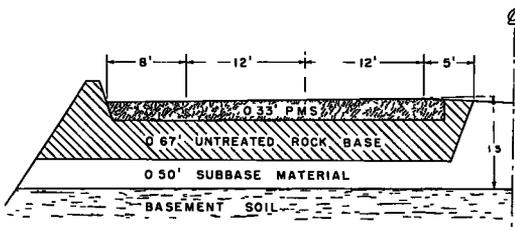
Typical cross section road VII-LA-4-J, Station 372+20 pavement cracked.
